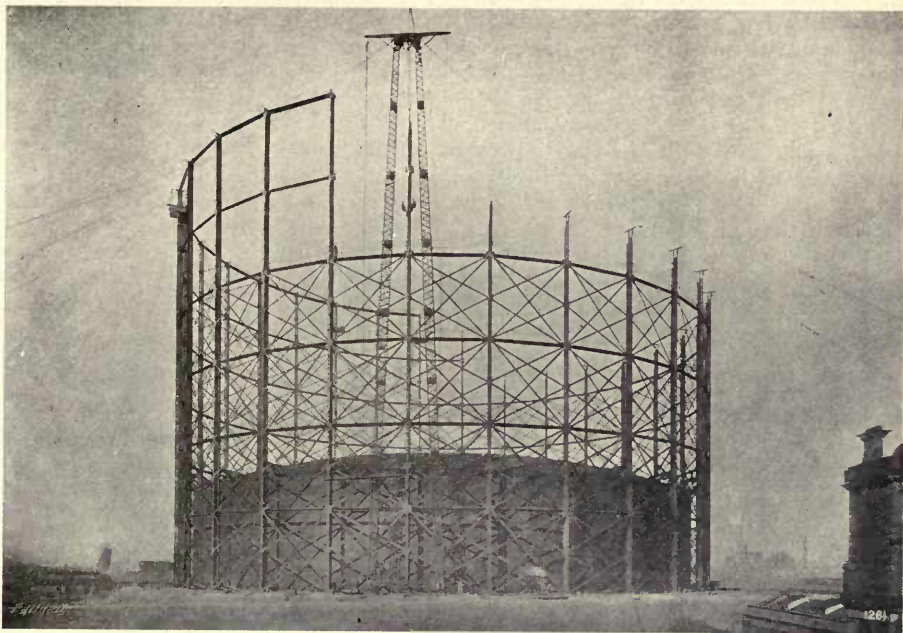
VIEW OF THE OLD KENT ROAD GASHOLDER, SHOWING GUIDE-FRAMING IN COURSE OF CONSTRUCTION, AND SHEAR-LEGS, 180 FT. HIGH, USED FOR ERECTING FRAMING.
